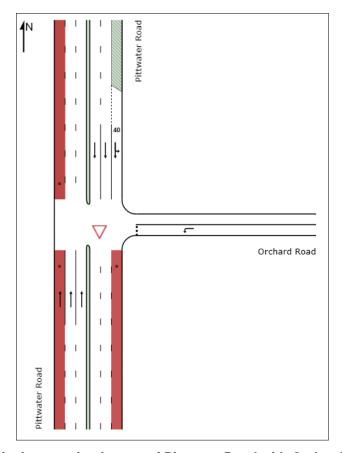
Priority Intersection Layout of Pittwater Road with Orchard Road (SIDRA)
